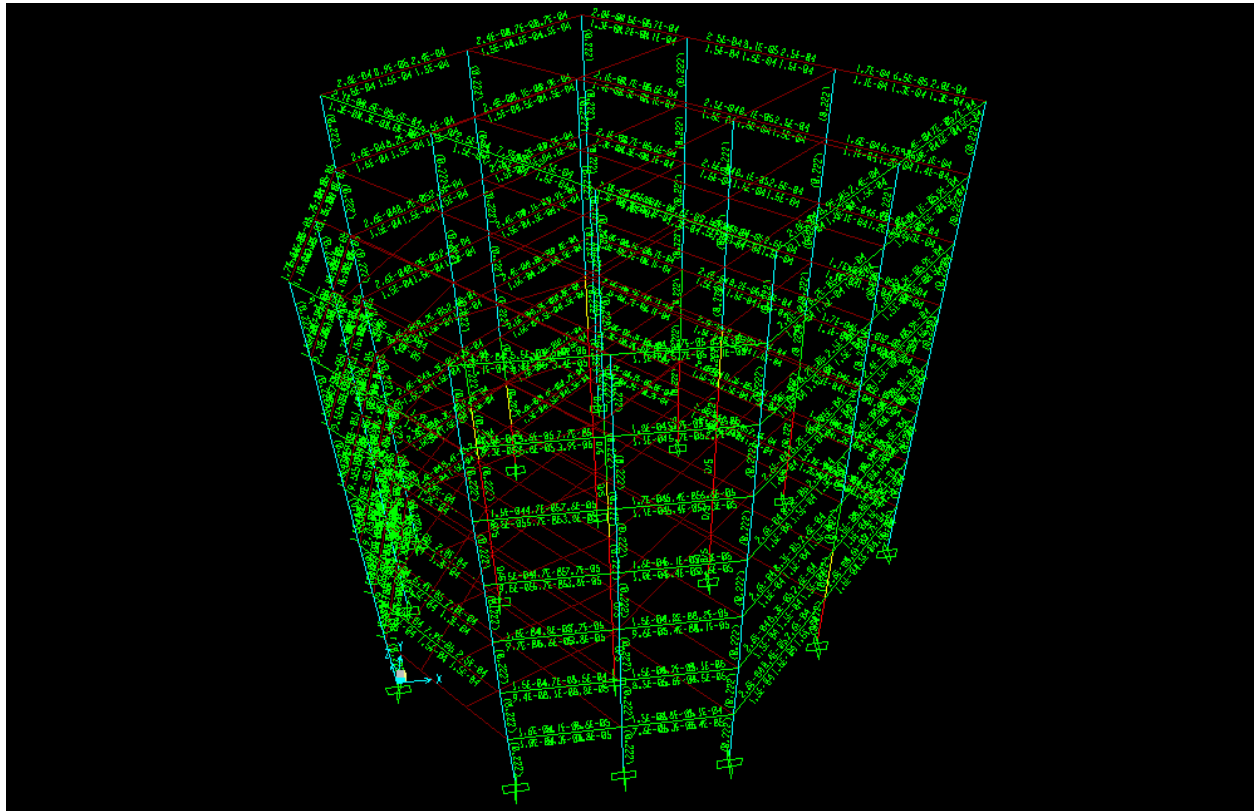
IMAGE OF CONCRETE BUILDING.
